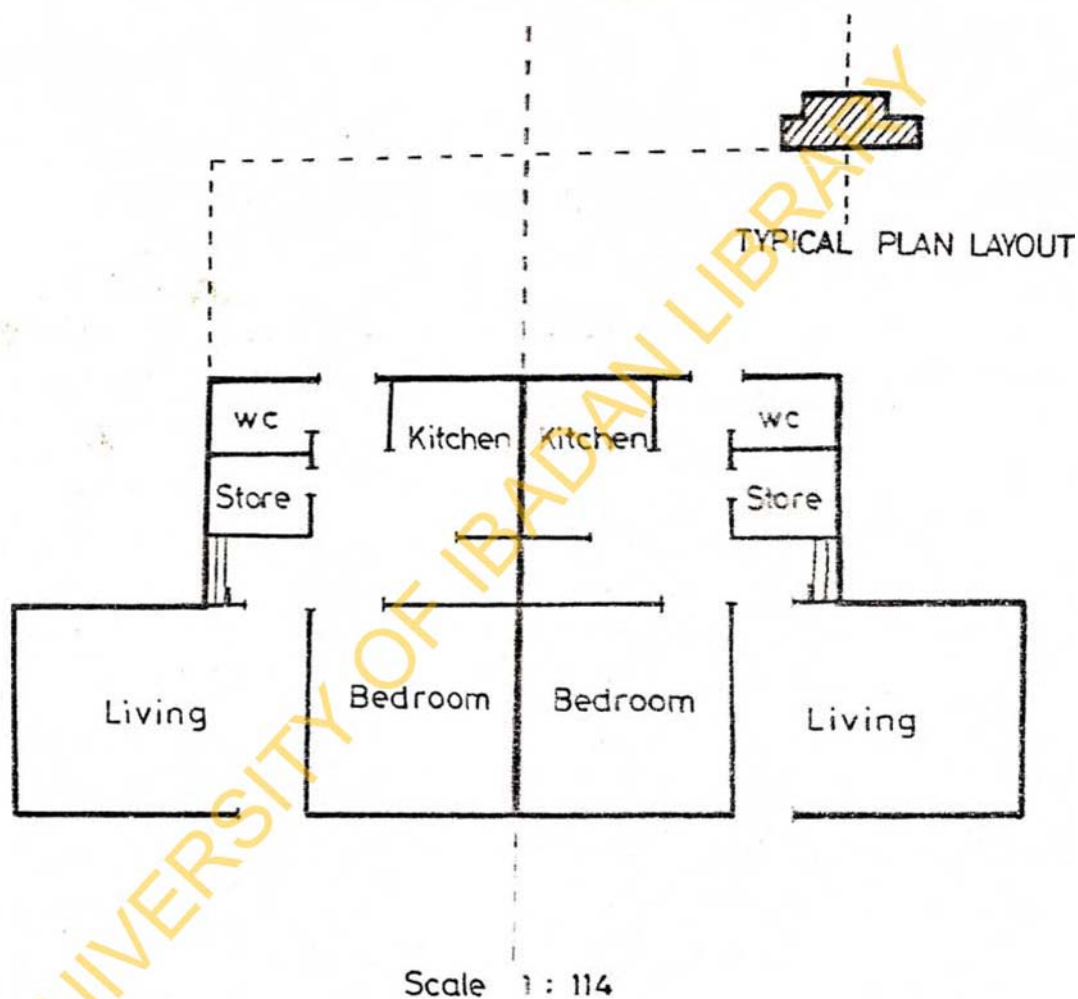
Typical floor Plan of Federal Government Low Cost Housing – One Bedroom Core House
